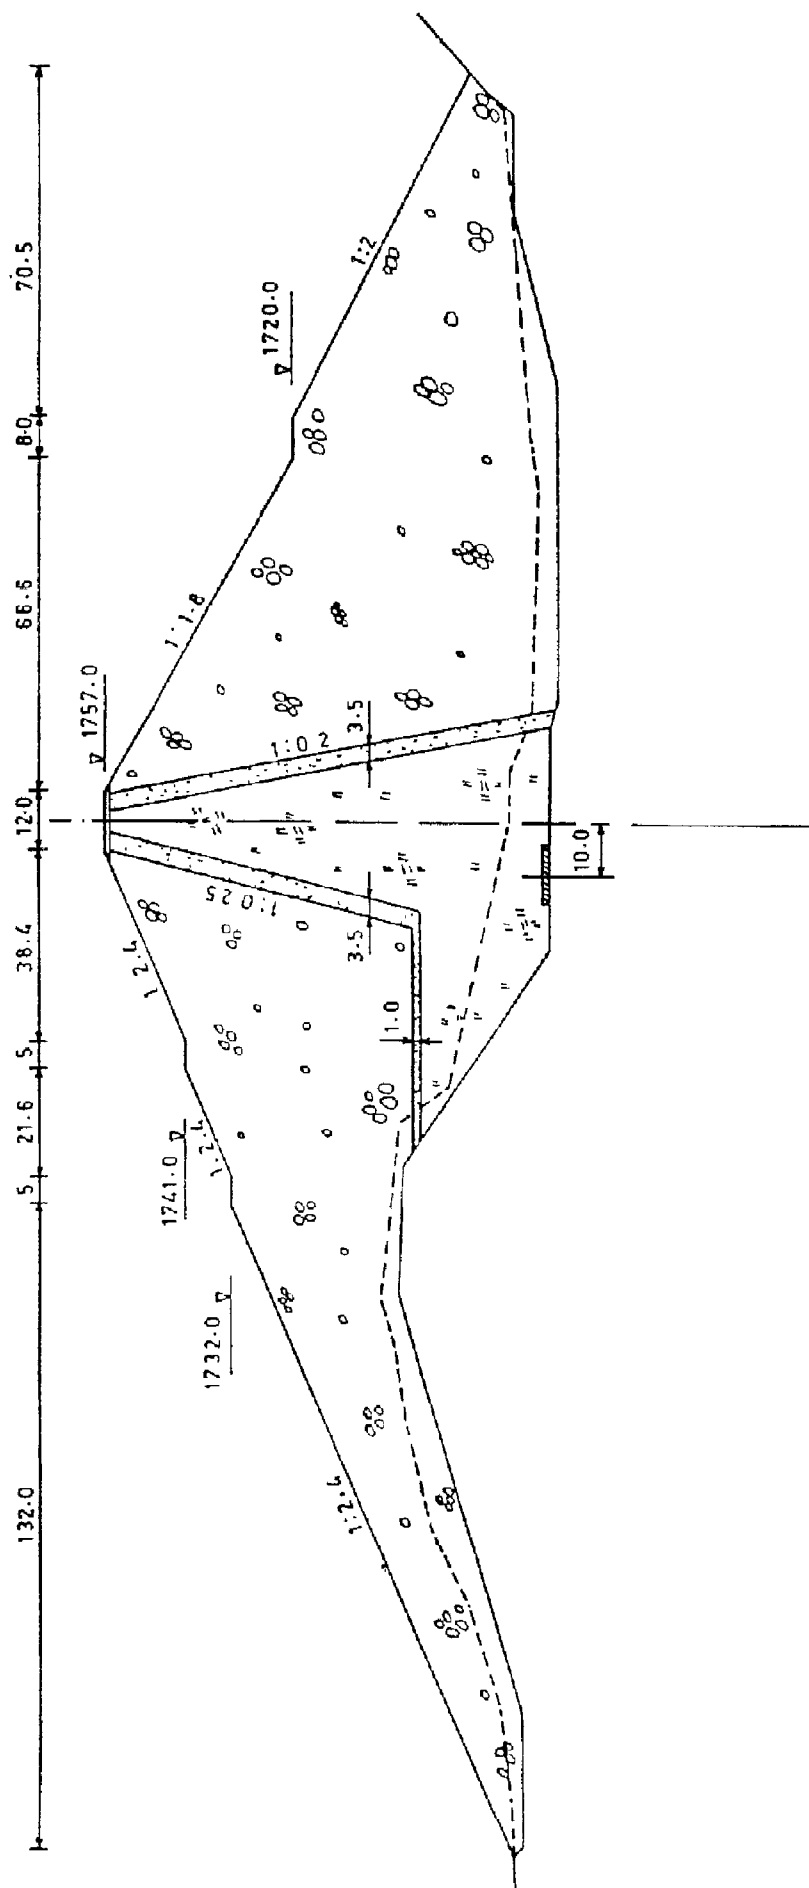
PROPOSED SECTION OF KAPS DAM (NOT FINAL)
